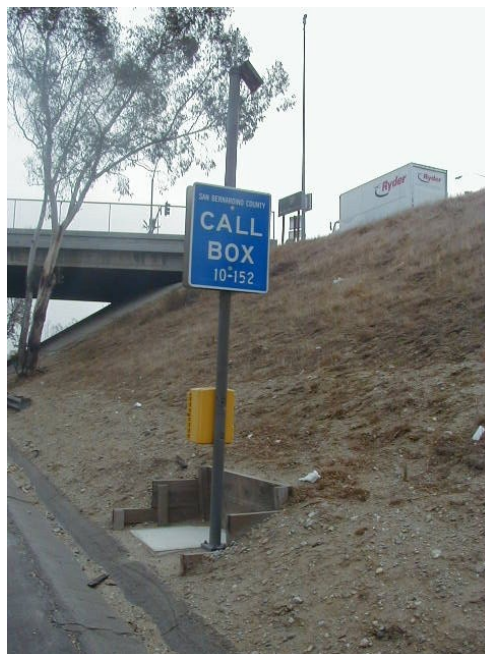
Site Type C – Installed on a Fill Slope (See Chapter 115, Section 5, Topic 5)
